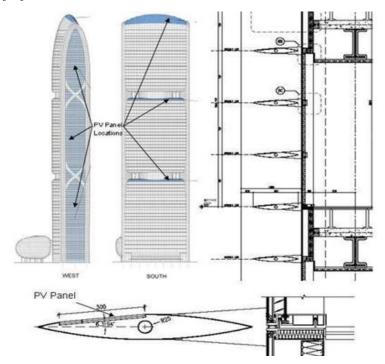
Perforated Silver Ventilation blinds is in the east and west double façade PV panels mounted to the exterior sunshades on the western façade [15]
